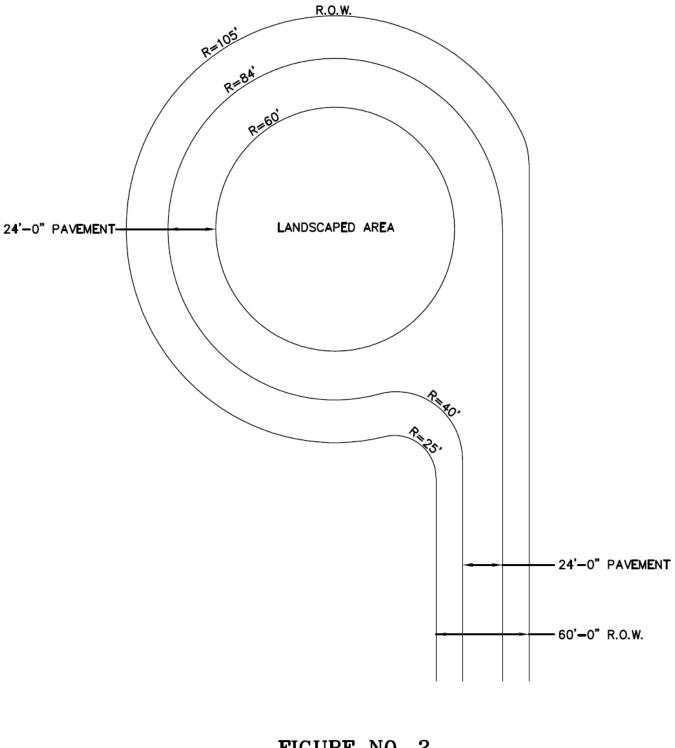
TOWN OF CHESTER, NEW HAMPSHIRE <u>TYPICAL CUL-DE-SAC</u> NOT TO SCALE
